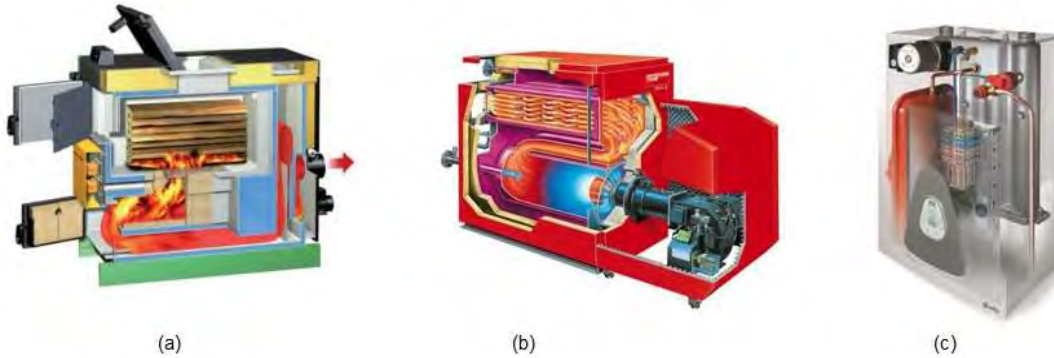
(a) solid fuel boiler; (b) liquid / gaseous fuel boiler; (c) electric boiler. [11]
